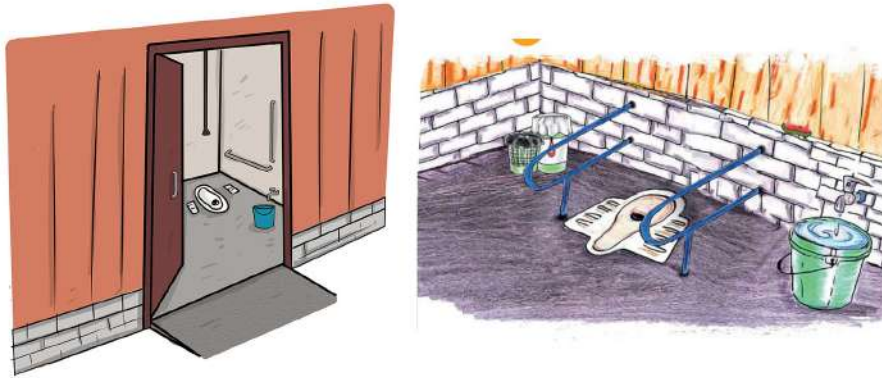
& 3: For squatting (Indian) type toilet: Ensure the placement of the pan on the same floor level while constructing. Install/fix grab bars and rails on the floor/wall (Grab bar height should not be more than 2 ft 6 inches). Install tap point inside/ bidet faucet/or store water in containers for anal cleansing
